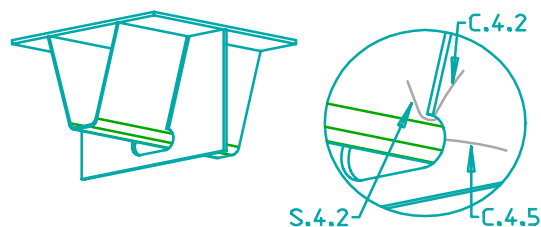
Closed stiffener through crossbeam with oval cope hole
